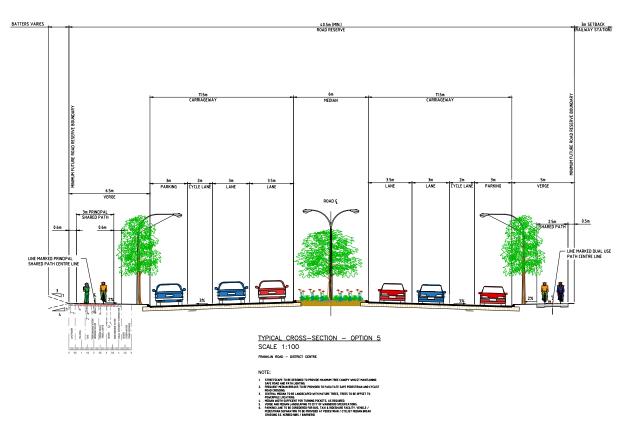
Cross-section Franklin Road (Neighbourhood centre)
